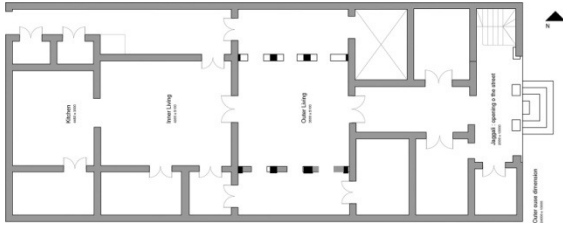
Typical plan of vernacular houses in Devanahalli with central raised living spaces.
